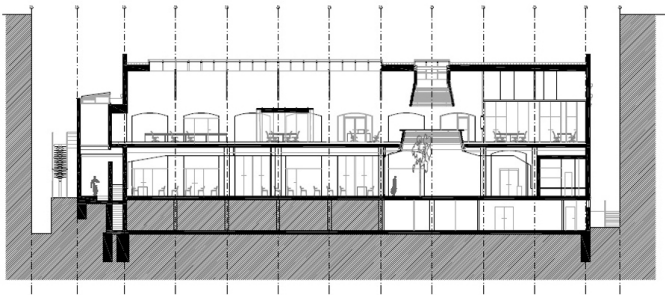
Section through building showing angled skylight (Botin Foundation).¹
